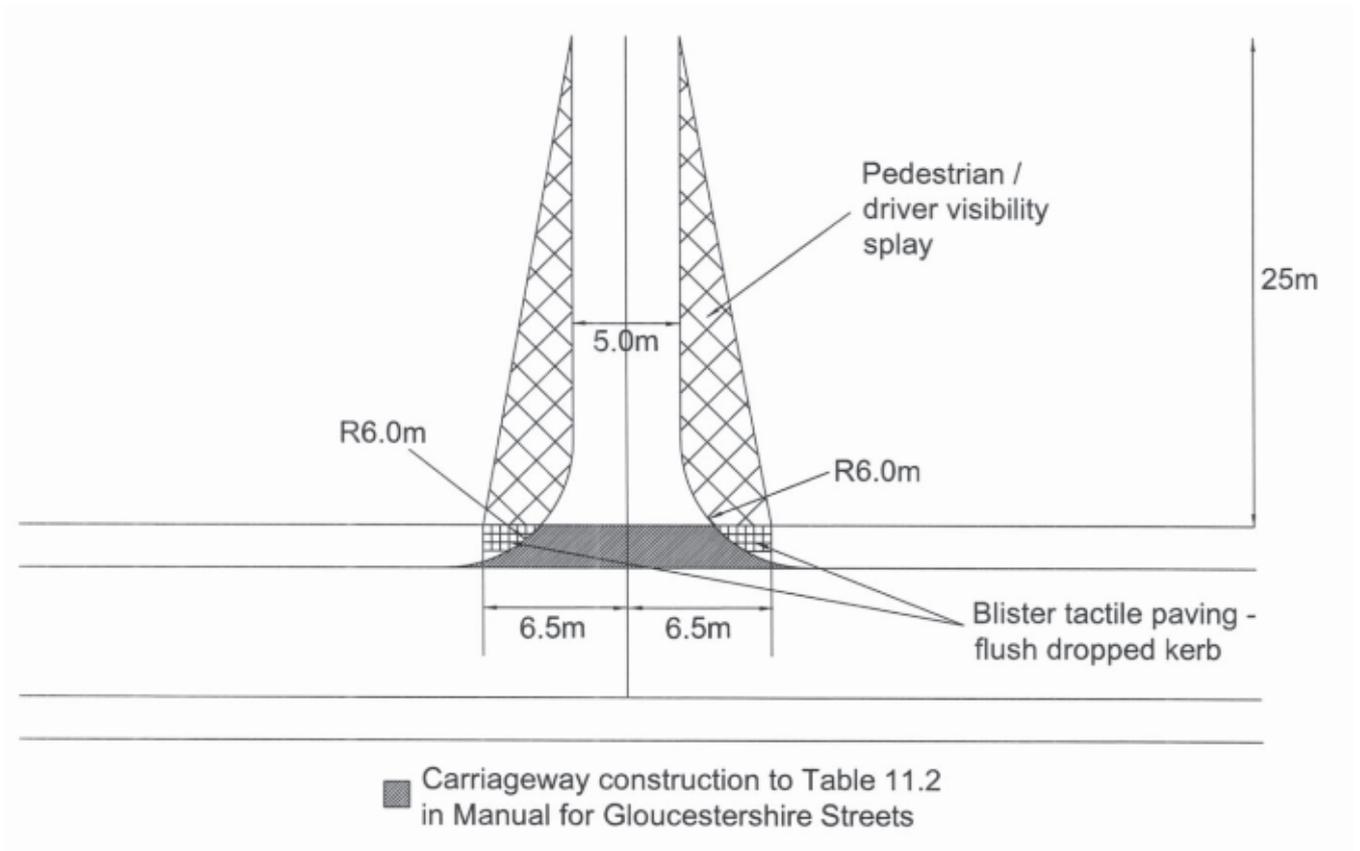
Standard access to 2 to 5 dwellings over footway (to be used on Class 3 highway).
